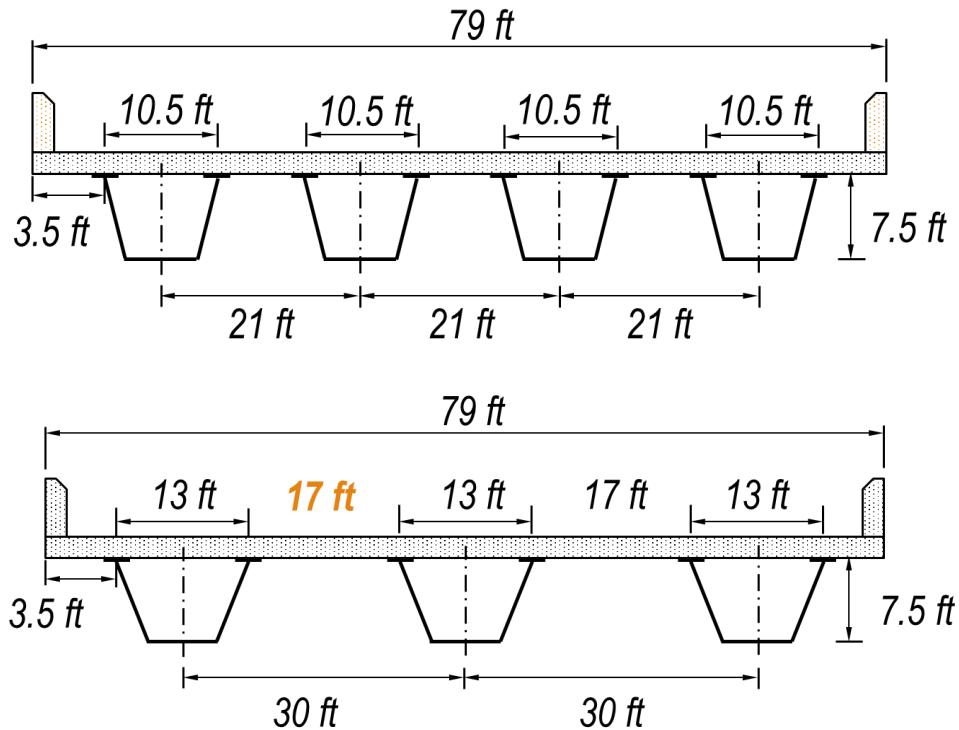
Sketch Showing the Bridge Cross Section with Increased Girder Spacing
